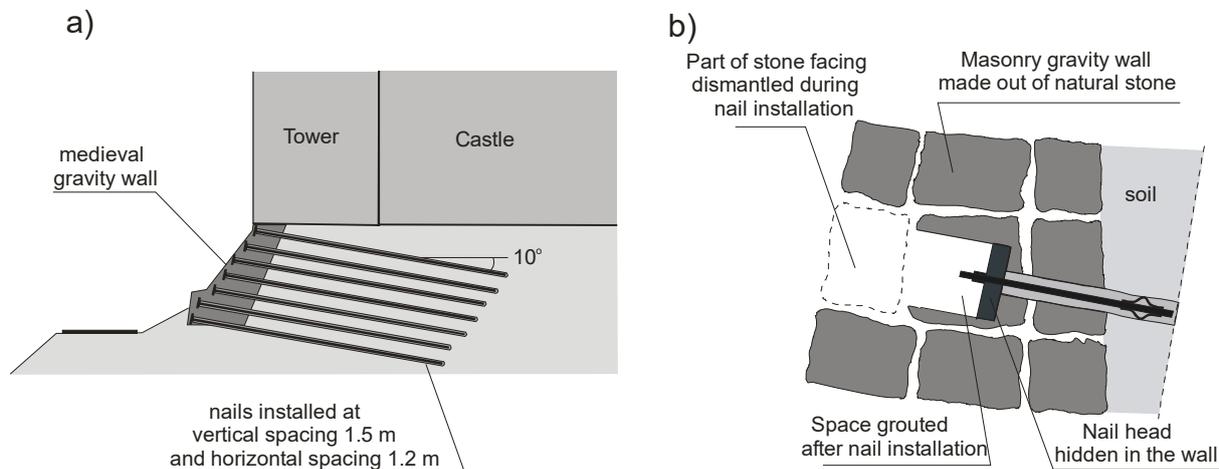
Alternative approach of slope stabilisation using soil nailing technique: a) cross-section of nailing zone, b) solution for fastening the nail head within the masonry
